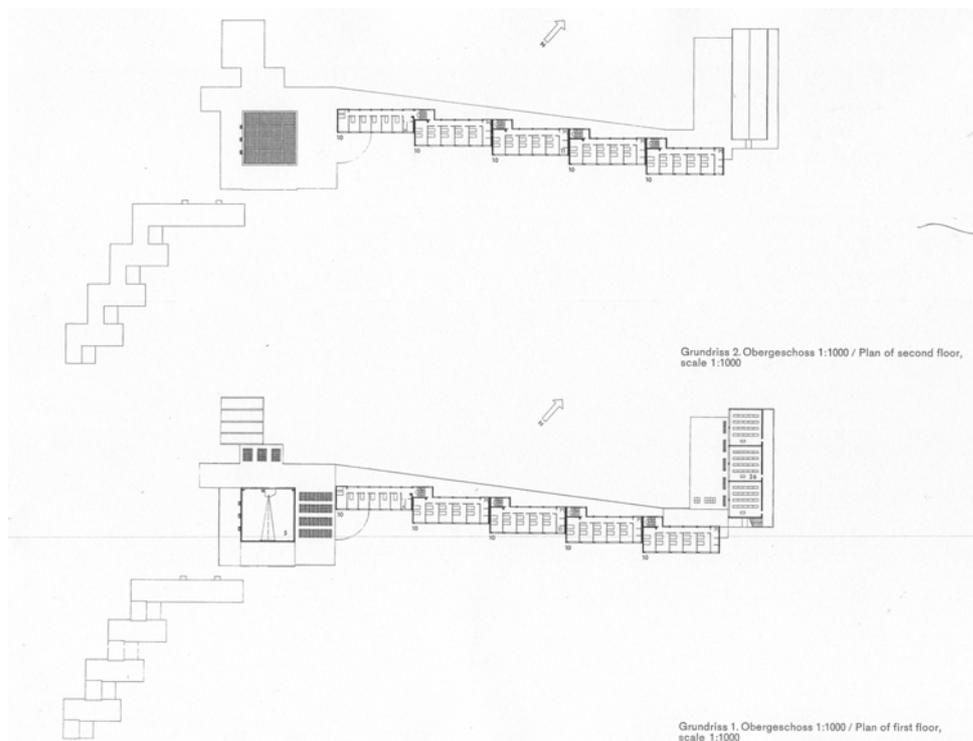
Federal School of the German Trade Unions Federation, First and Second Floor Plans
